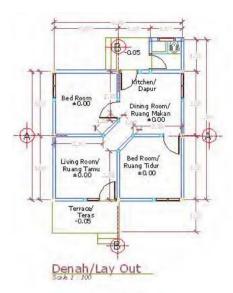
Build Change Pilot Project House, 2 bedroom, 2 living room, toilet outside.
